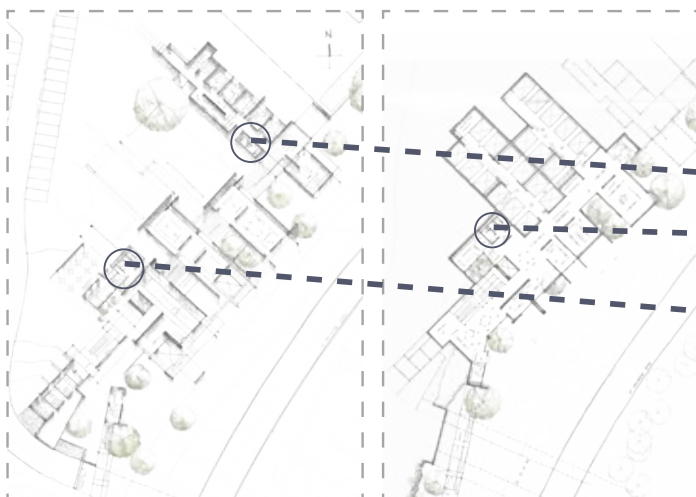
Placement of disabled toilets on ground floor and basement plans.
